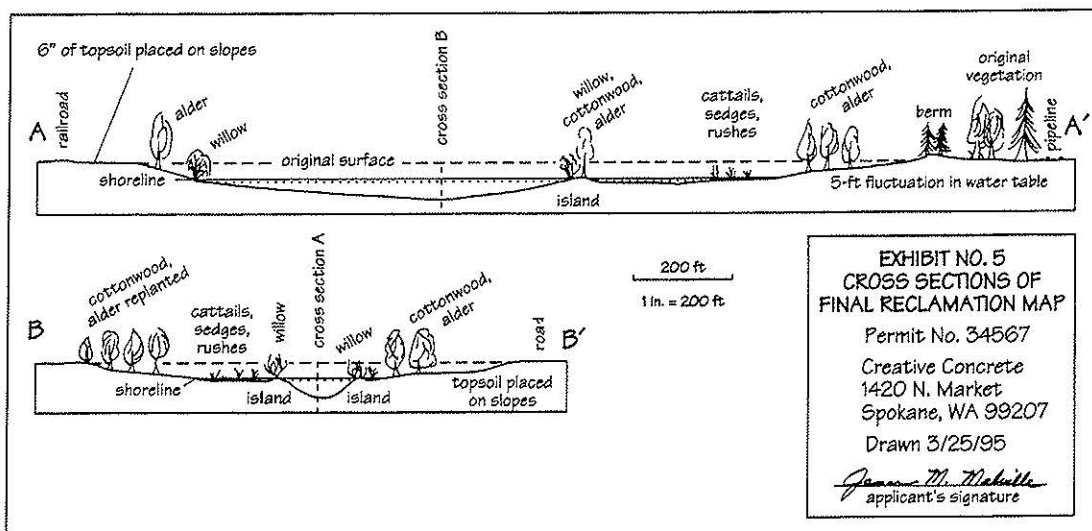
Cross sections for the final reclamation plan of the mine shown in Figure 1.4. The types and placement of vegetation and the slope of the pond banks are shown. (Modified from Norman and Lingley, 1992. Not to scale; this map has been reduced to fit on the page.)
